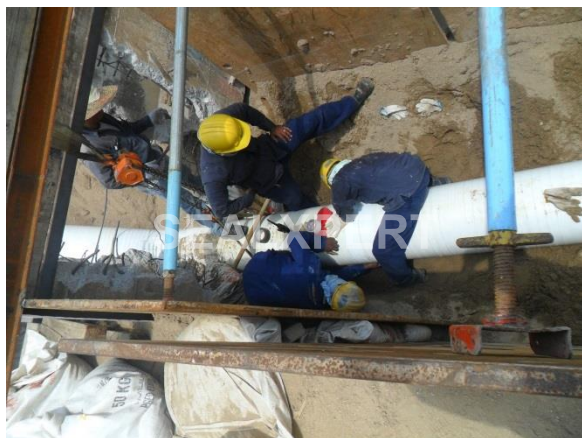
Onsite Wrapping of SealXpert Poly Outer Wrap after welding and NDT is completed
